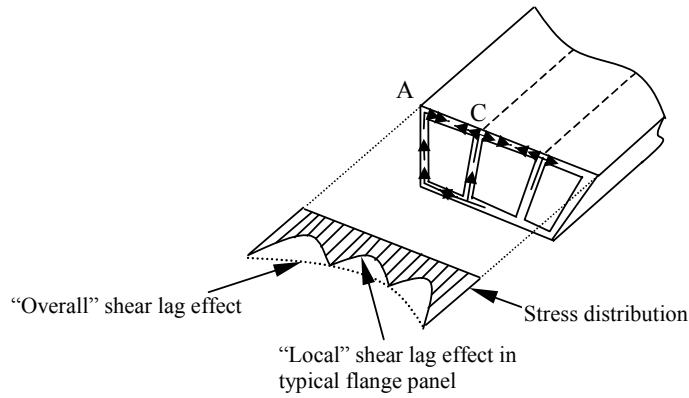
Longitudinal flange stresses in multi-cell box girders
